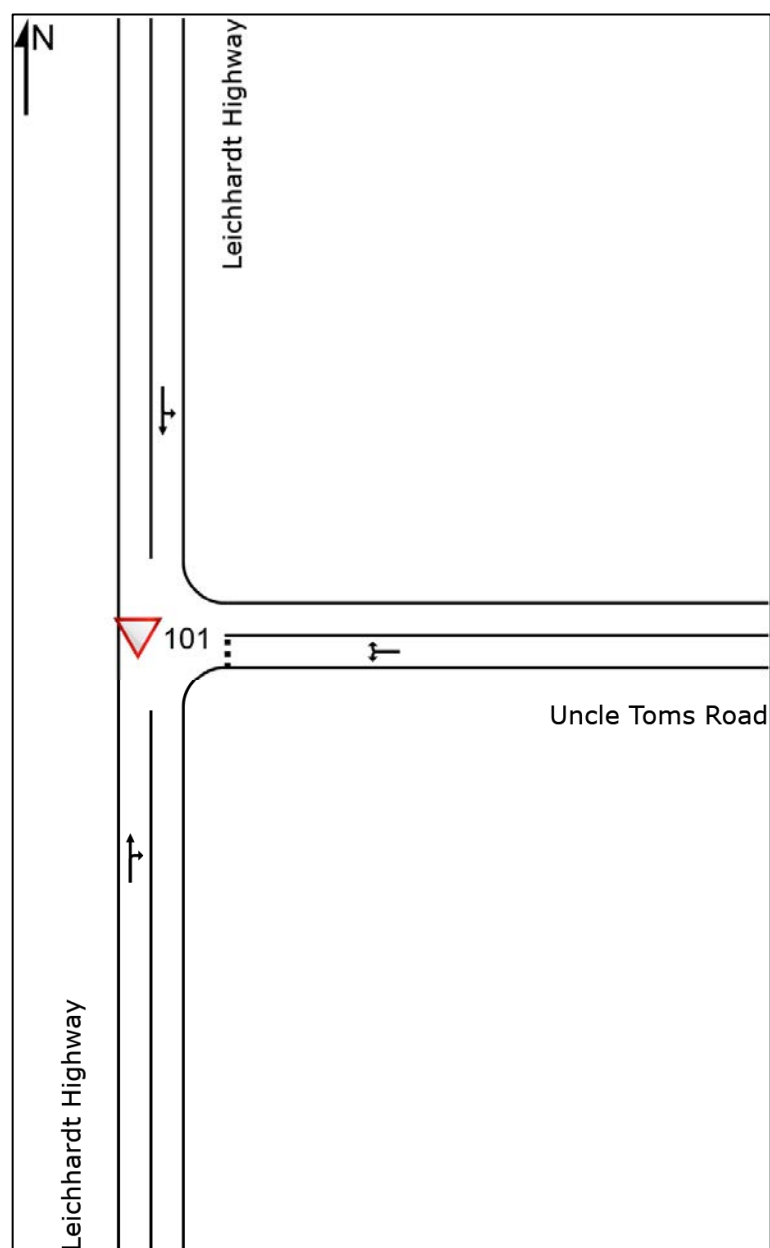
Leichhardt Highway/Uncle Toms Road intersection layout
